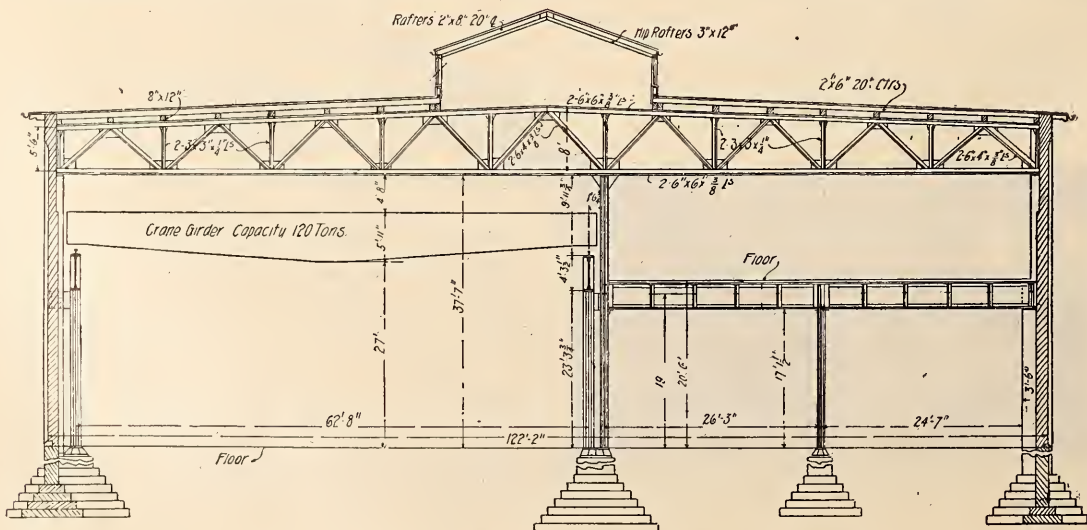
CROSS SECTION OF LOCOMOTIVE AND MACHINE SHOP—TERMINAL R. R. OF ST. L.
